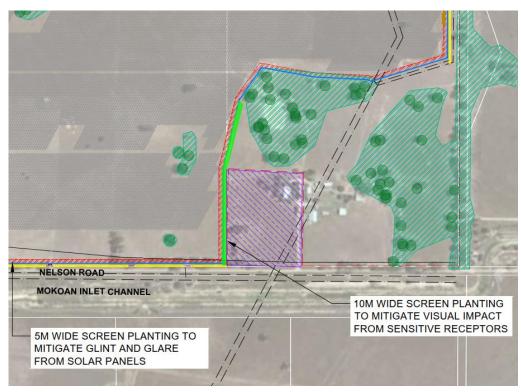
Extract from Landscape Plan (10m wide planting to the east and 5m wide planting to the south)
